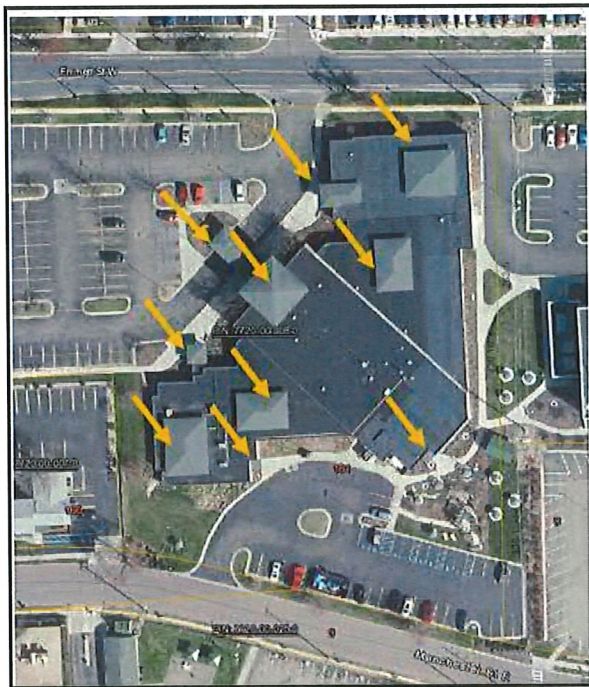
Arrows point to ten roof sections that will be replaced with metal sheets under the subject proposal. Aerial photograph provided by City of Battle Creek, dated April 2020 (approx.).
